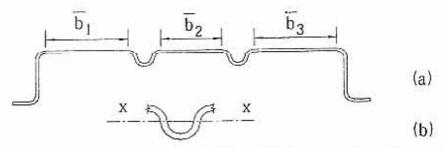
Sections with Multiple-Stiffened Compression Elements
